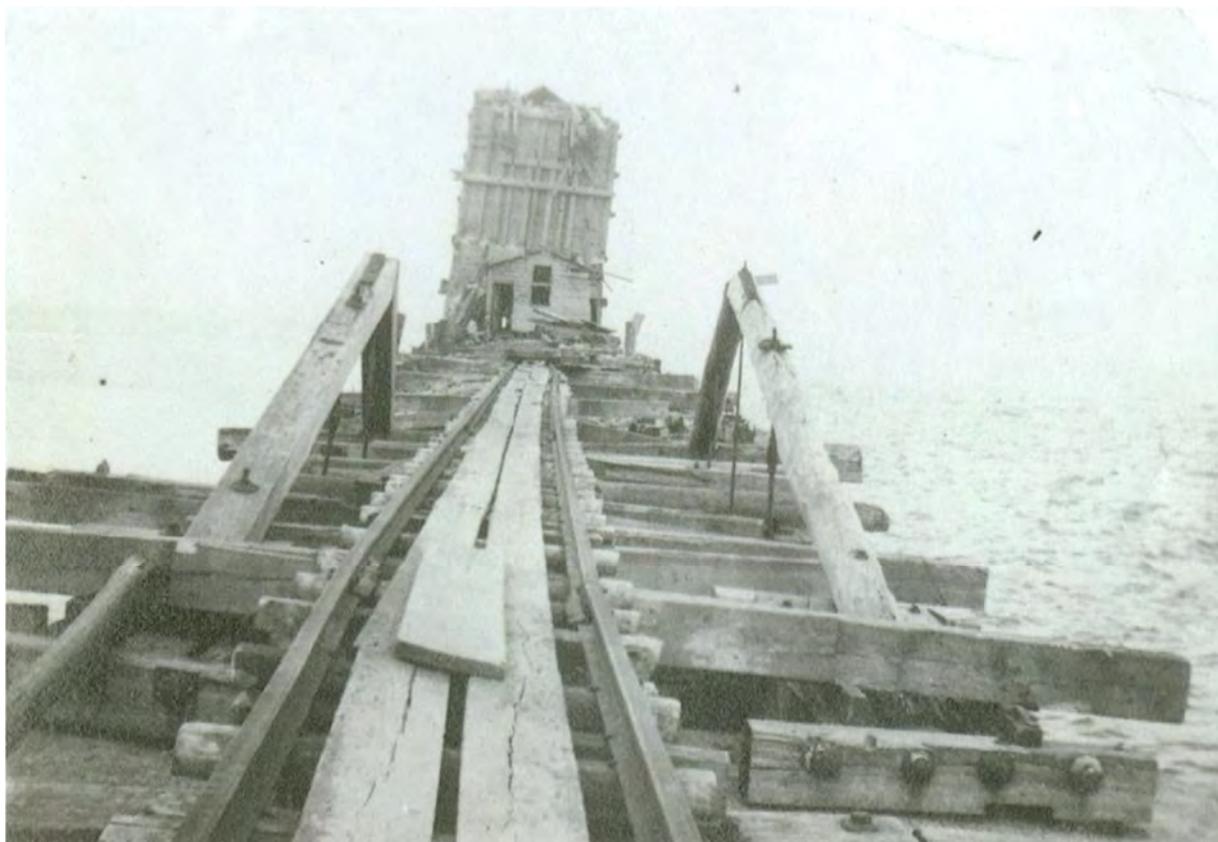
Ronk's Pier with Rail System and Building, ca. 1860s-1870s (Thomsen et al. 2020)
